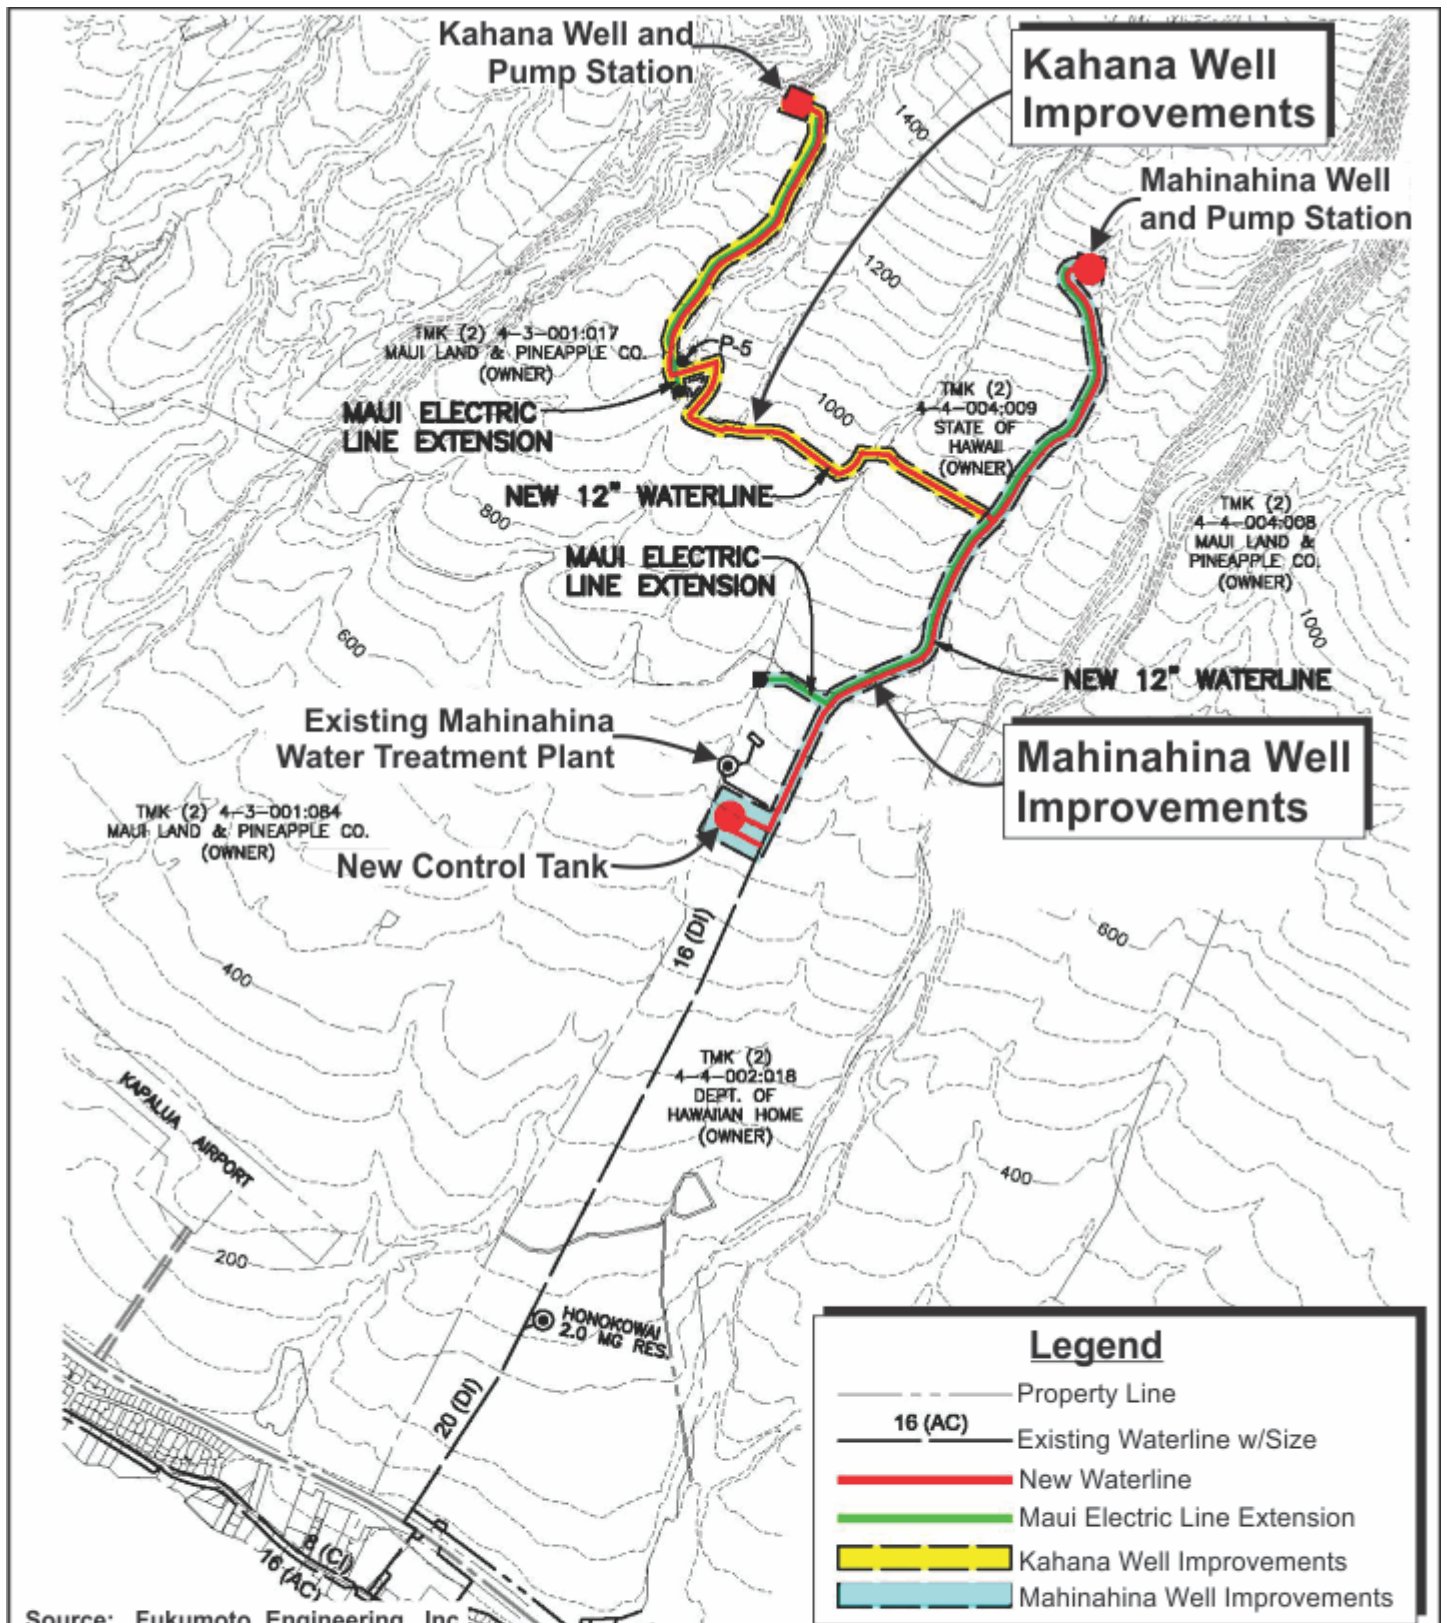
Proposed West Maui Source Development Project Overall Conceptual Plan
